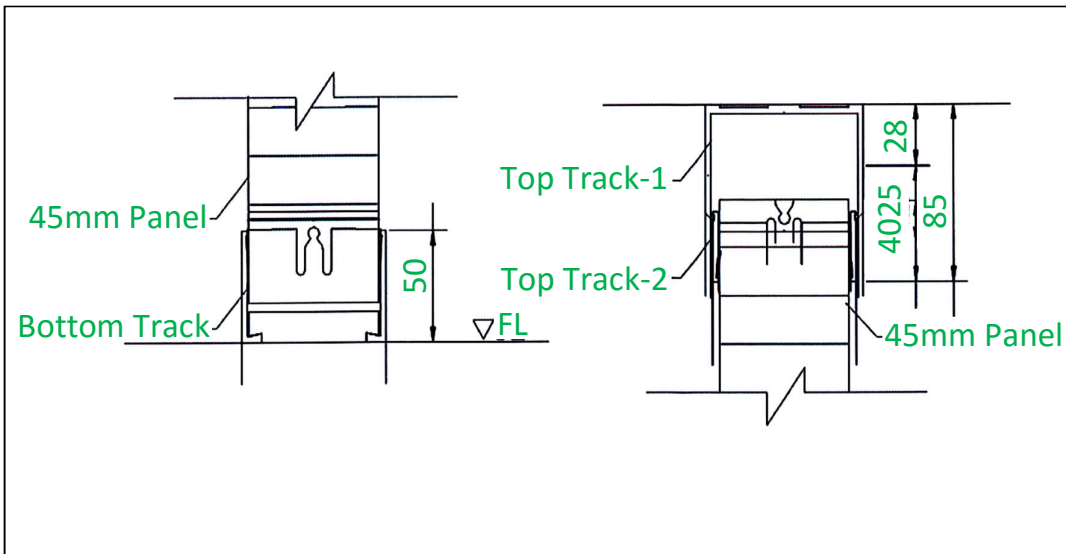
SFS3000 System Panel Top and Bottom Track Joint
